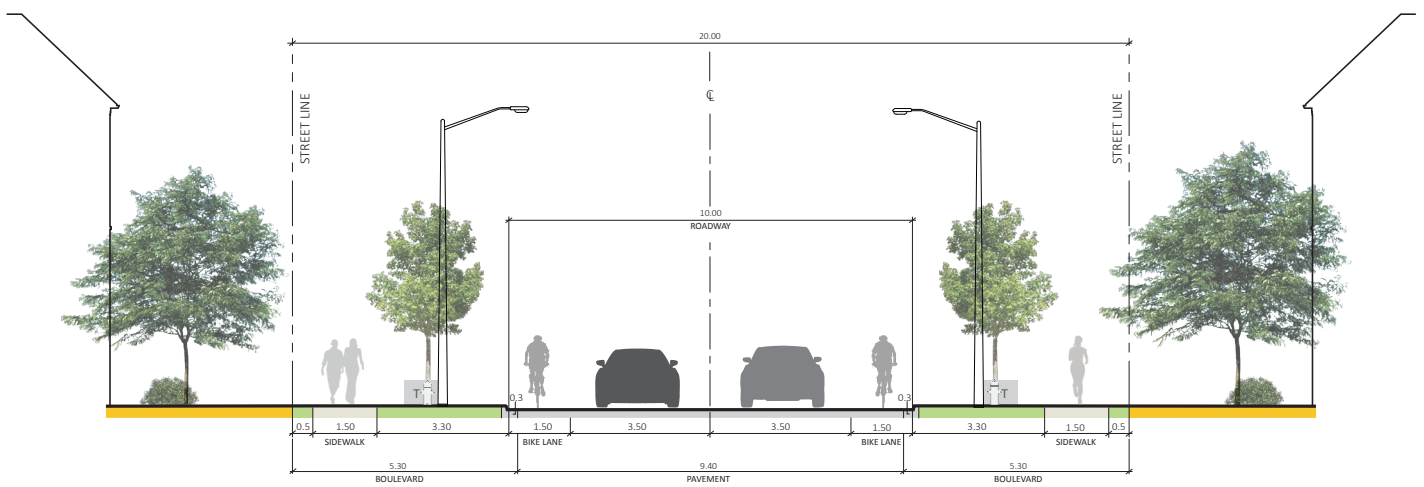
Residential Collector Road (20m R.O.W.) Cross-Section
